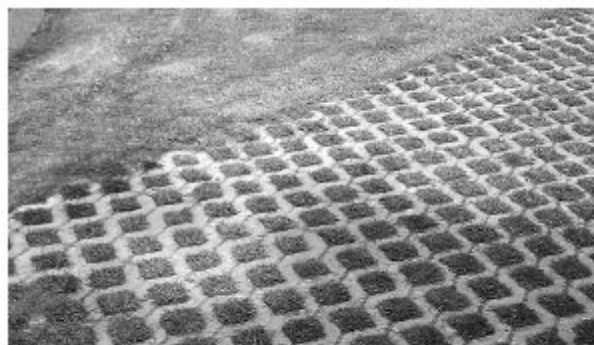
Concrete grid pavement substantially reduces runoff to levels approximating grass cover.
